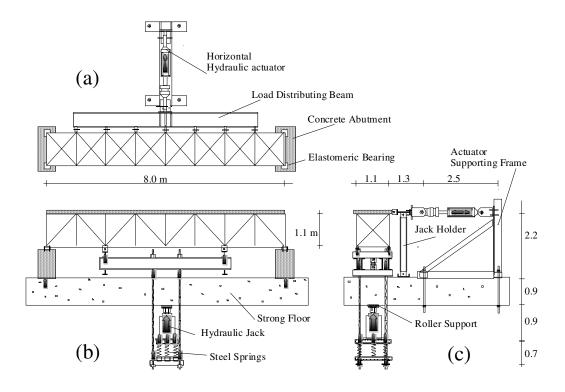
Plan and elevation views of pseudodynamic test set-up.
